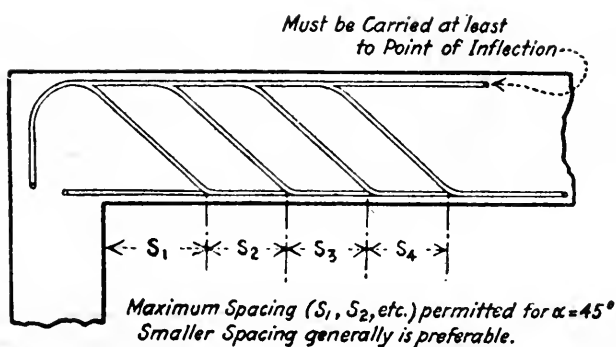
Typical Beam With Web Reinforced by Means of Series of Inclined Bars
